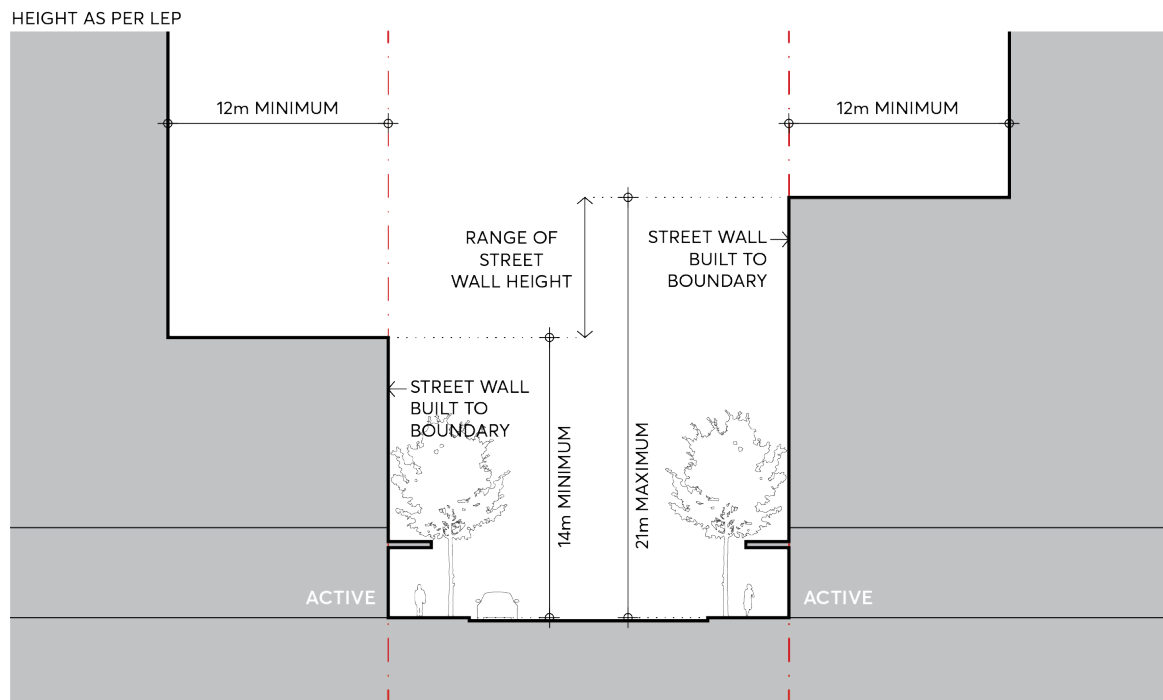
George Street - Street Setbacks and Street Wall Height
